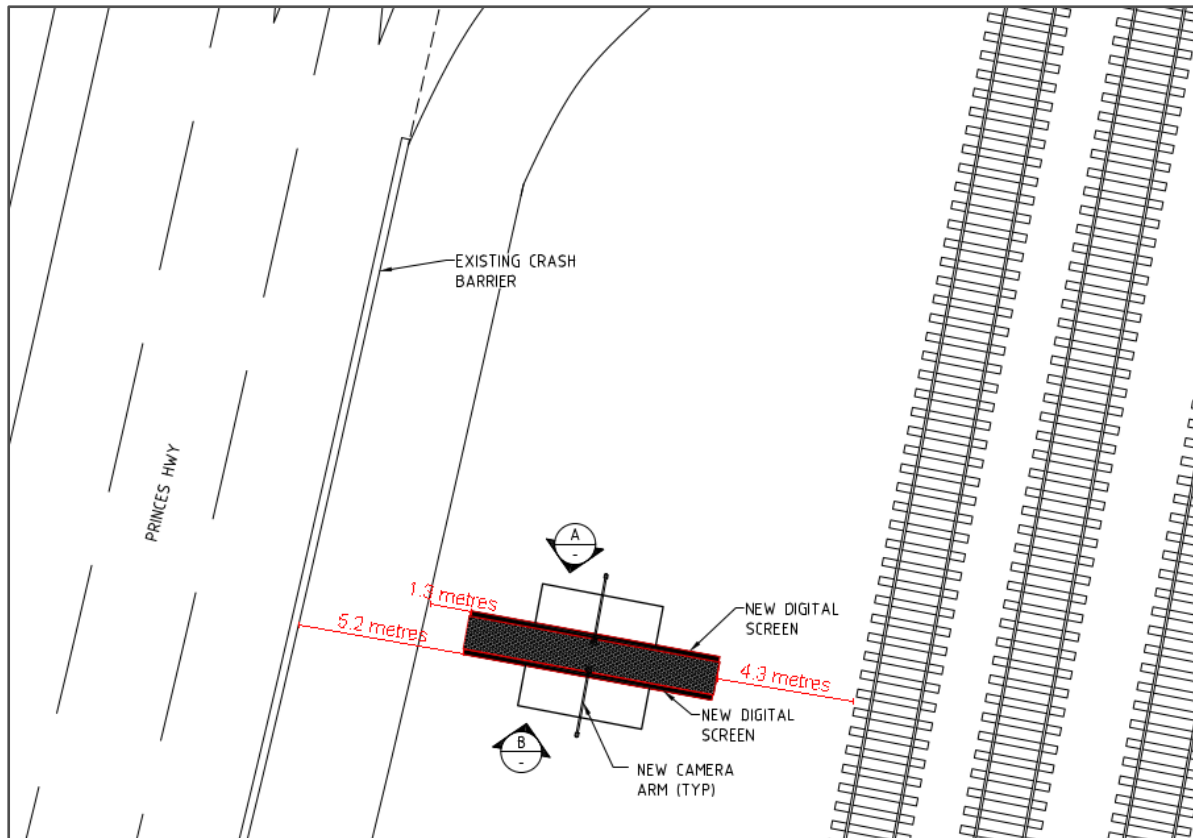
| Site plan with setback notations (Source: Applicant's documentation and the Department)
